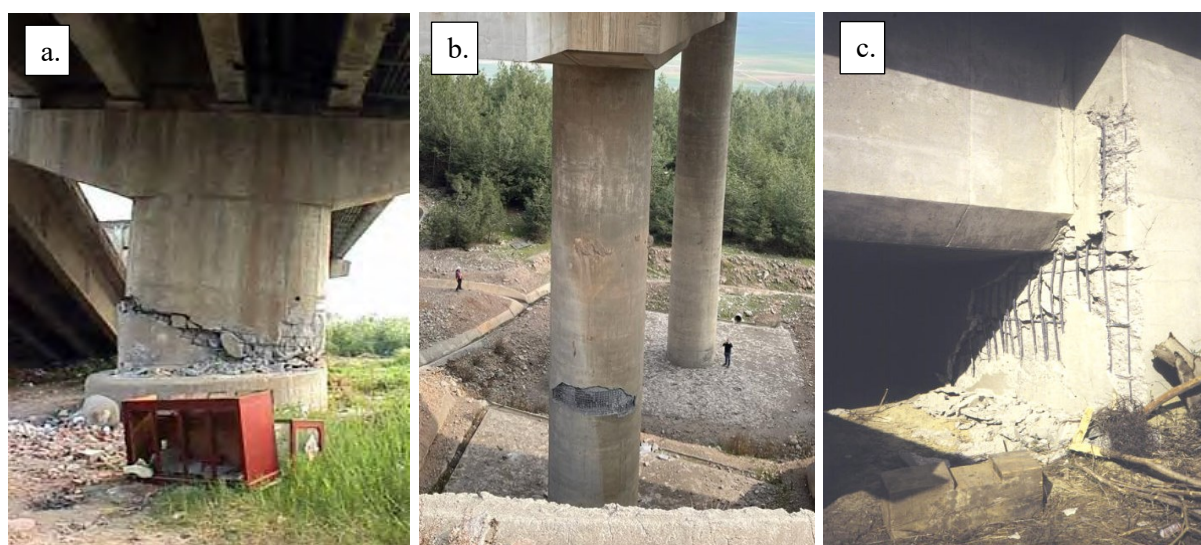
Substructure damage: a. heavy damage to column due to shear failure [16]; b. moderate flexural damage to column [30]; c. moderate damage to abutment wall – cracking and delamination of concrete [20]
